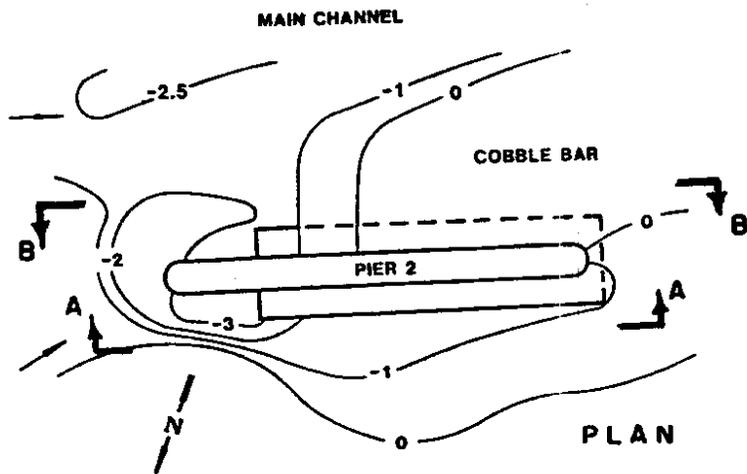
Local Scour at Pier 2, Bridge 5/216E
